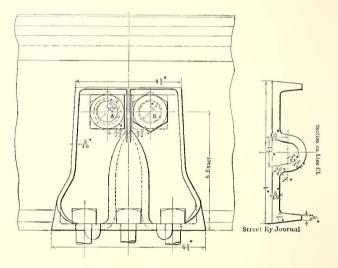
DETAILS OF SPECIAL RAIL CHAIRS ON BRIDGES
